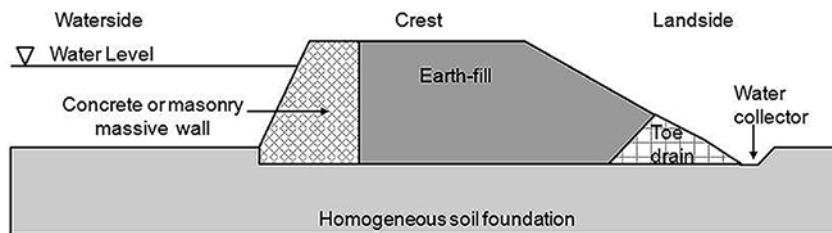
Composite levee with massive retaining wall on homogeneous soil foundation
